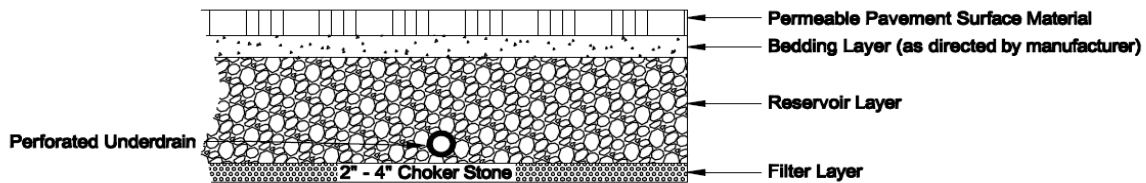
Cross Section of a Standard Permeable Pavement Design.
